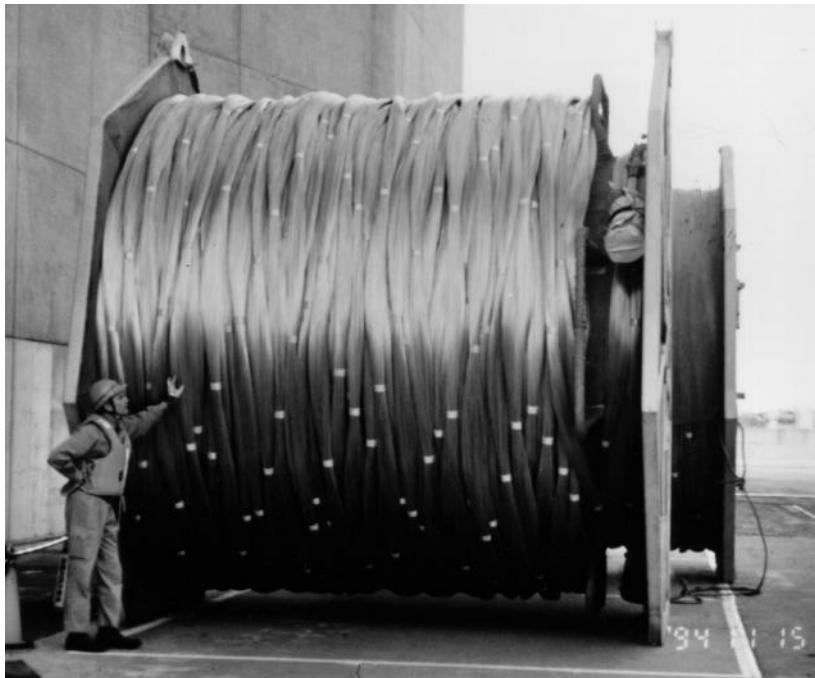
Reel of parallel-wire strand (PWS), Akashi Kaikyo suspension bridge, Kobe, Japan, 1994. Each socketed PWS is made up of 127 0.206 in. (5.23 mm) wires, is 13,360 ft. (4073 m) long, and weighs 96 tons. Plastic-tape bindings secure the strand wires at 1 m intervals. Sockets can be seen on right side of reel. These PWS are the longest and heaviest ever manufactured. (Courtesy of Nippon Steel—Kobe Steel.)
